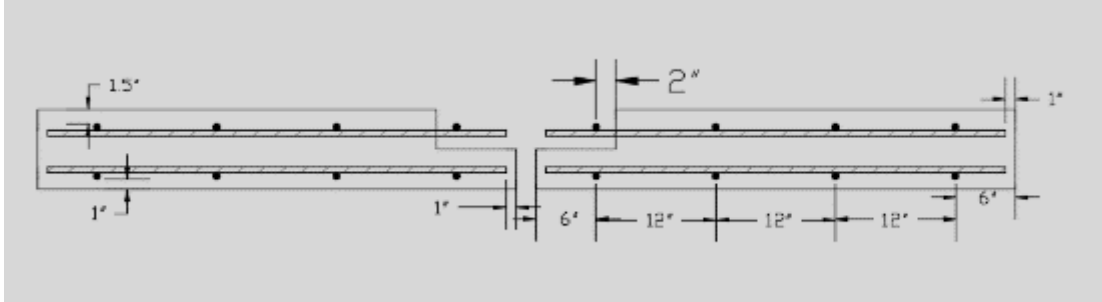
Elevation view of reinforcement excluding splice bar between slab specimens
